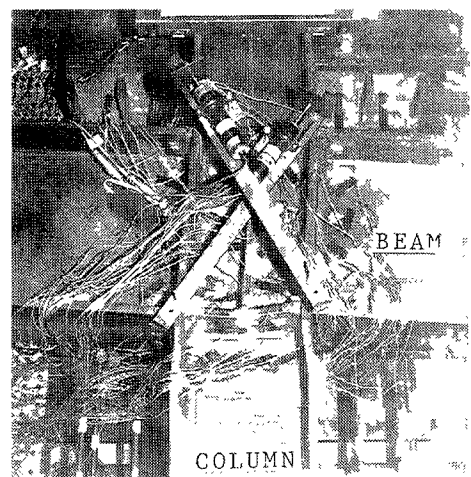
Panel zone deformation after test (SPEC. XFN-C)
